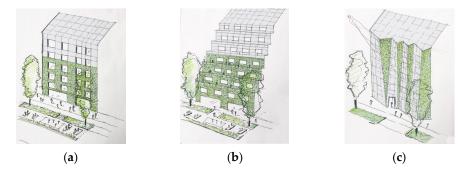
Preliminary design considerations for 'Mosaic': (a) Application of photovoltaic modules and greenery on the existing buildings; (b) Terracing of building façades; (c) Vertical, prismatic folding of building façades.
